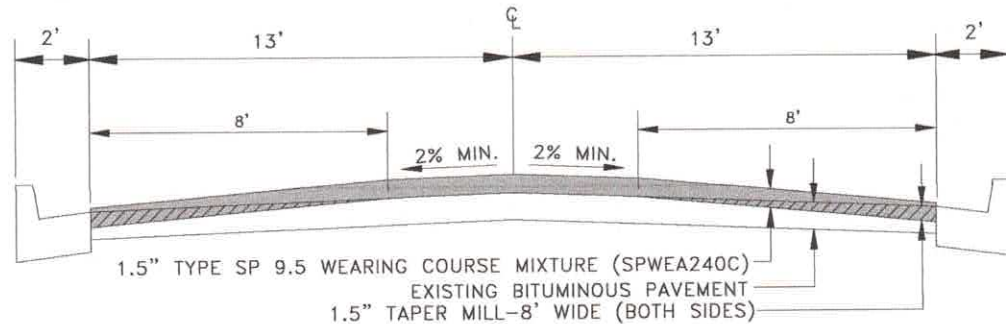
Residential Overlay with Curb – Bituminous Overlay Typical Section
